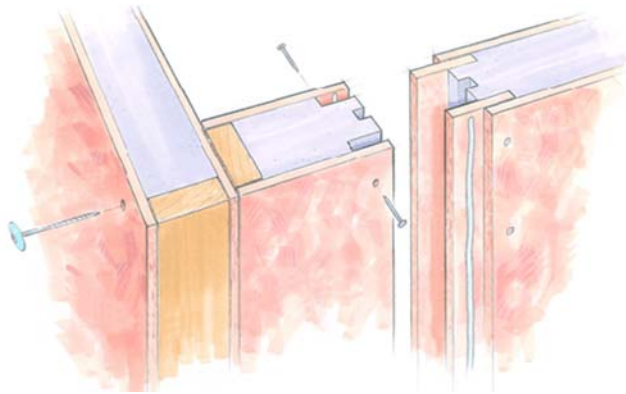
Common Panelized Construction Wall Panel Connection Geometries
